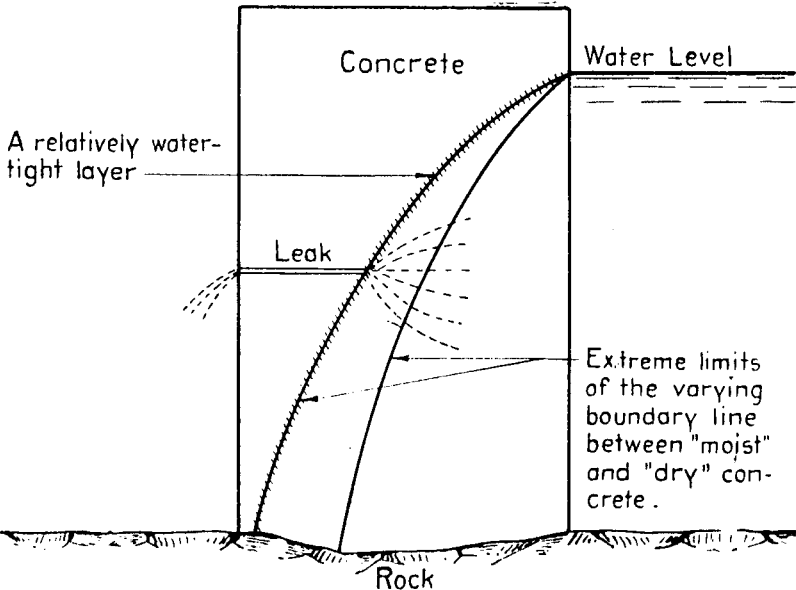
The boundary line between « moist » and « dry » concrete according to Westerberg.
